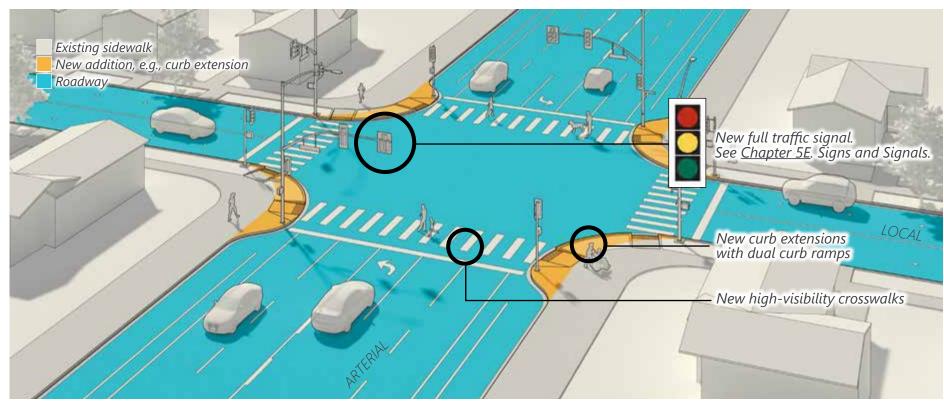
New Marked Crossings and a Full Traffic Signal at a Two-Way Stop-Controlled Arterial/Local Intersection.
